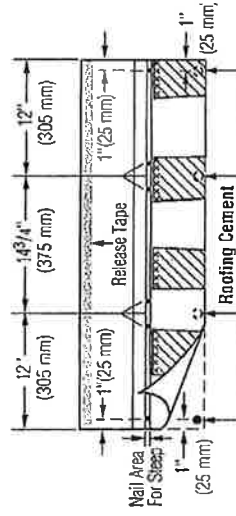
Use six nails and four spots of asphalt roofing cement on steep slopes.
